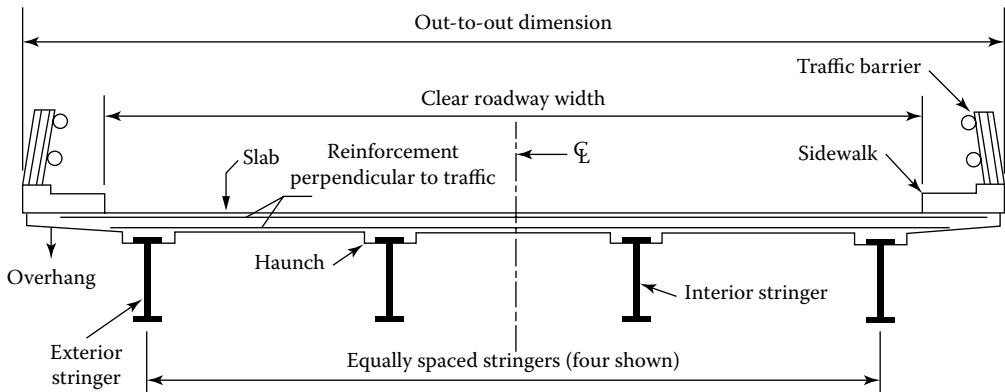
A typical slab-steel beam bridge. The reinforcement in the deck slab runs *perpendicular* to traffic.
